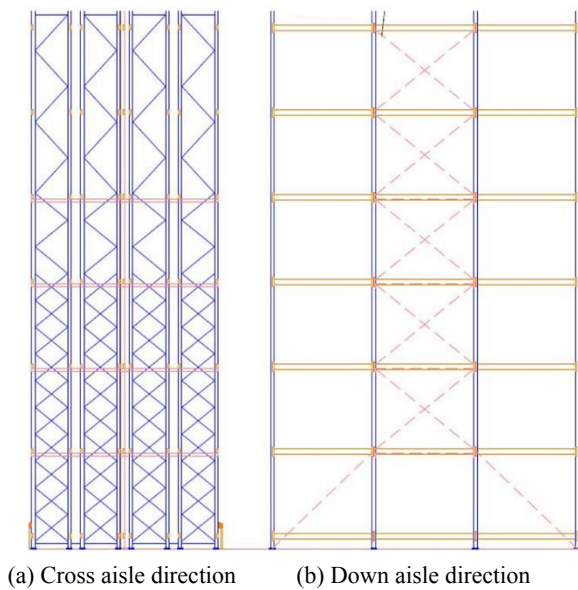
Cross aisle and down aisle direction views of typical racking systems (Firouzehaji 2016)
